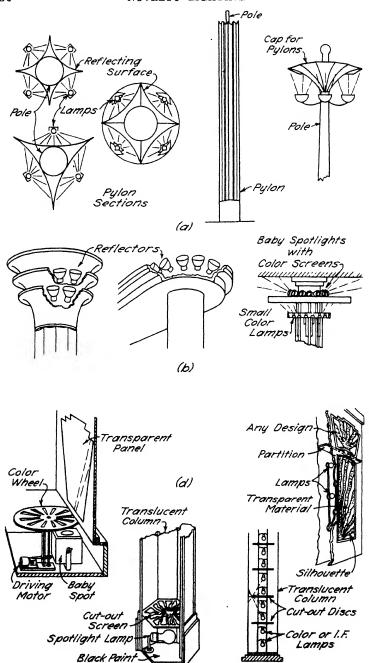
A.1,22,29 Columns, pilasters, and pylons.
